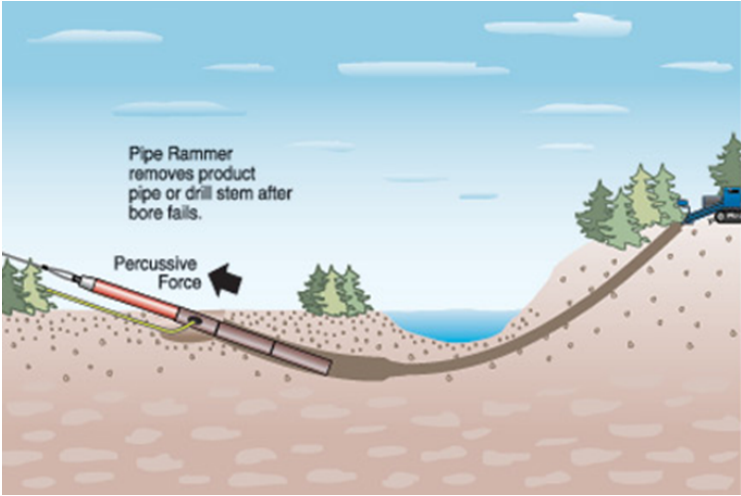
Pipe ramming in HDD. (Source: ISTT)
